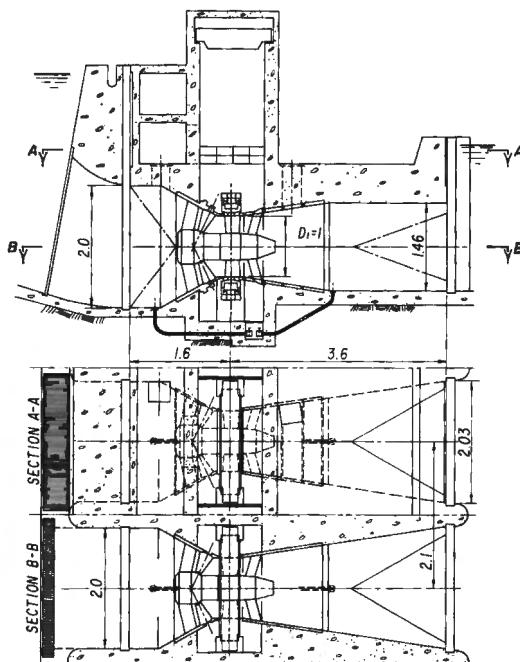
Standard Rim Generator Flow Passage Dimensions (Escher Wyss)
